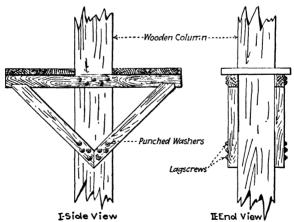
Wooden column support for two motors. This arrangement is somewhat better than having but one motor mounted on a column (as in Fig. 50) because it tends to relieve the column of bending stresses.
